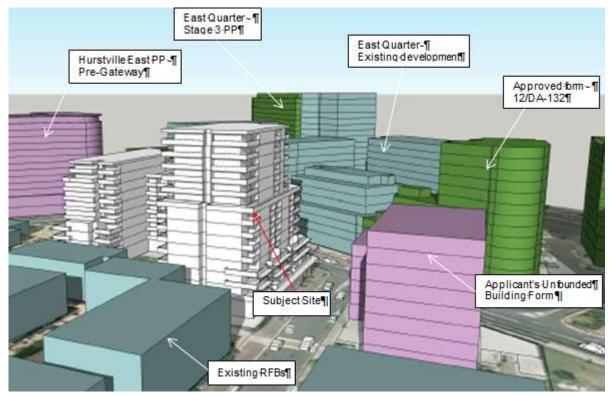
Planning Proposal Birds Eye View – Forest Road (Source: 3D Images - Planning Proposal Revision 6 – 11 March 2016)
